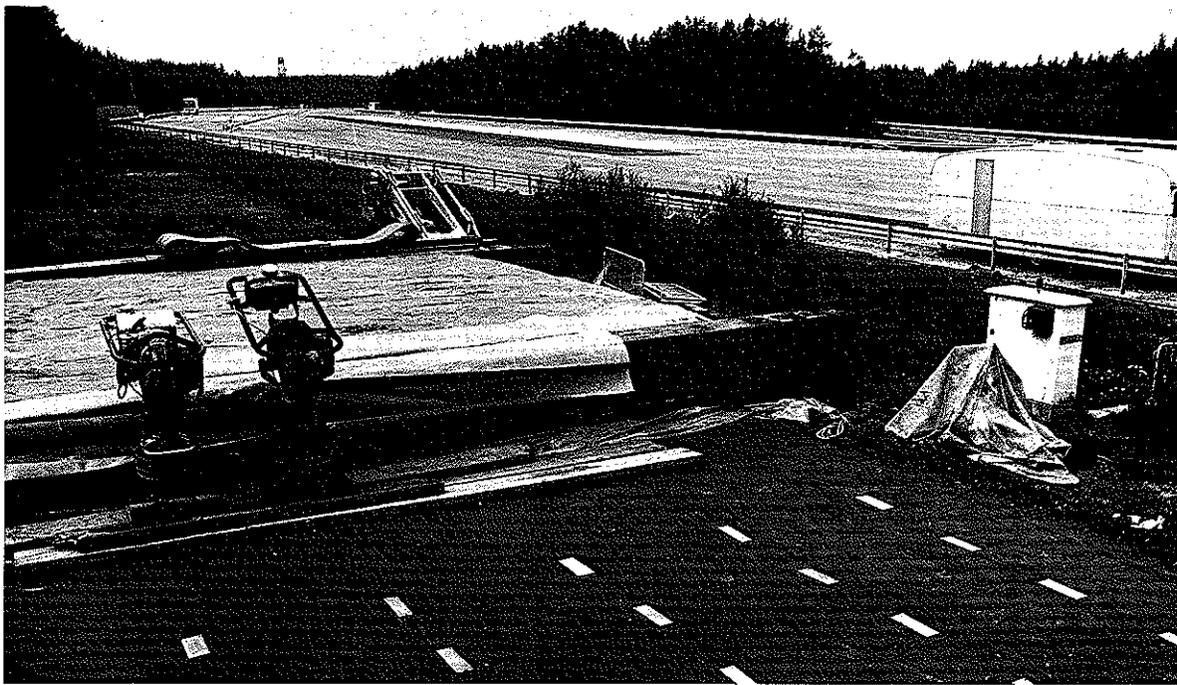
LAYOUT OF SPECIMENS IN THE CLAY EMBANKMENT ALSO SHOWING THE COMPLETED SAND EMBANKMENT AND THE COMPACTION PLANT USED.
